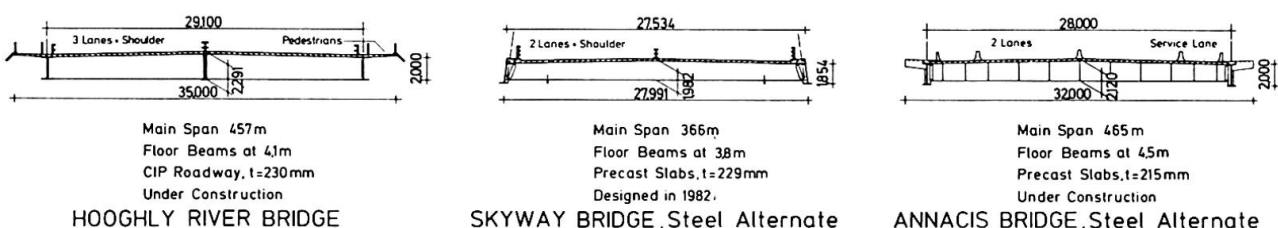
Cross-sections of long-span cable-stayed composite bridge beams
